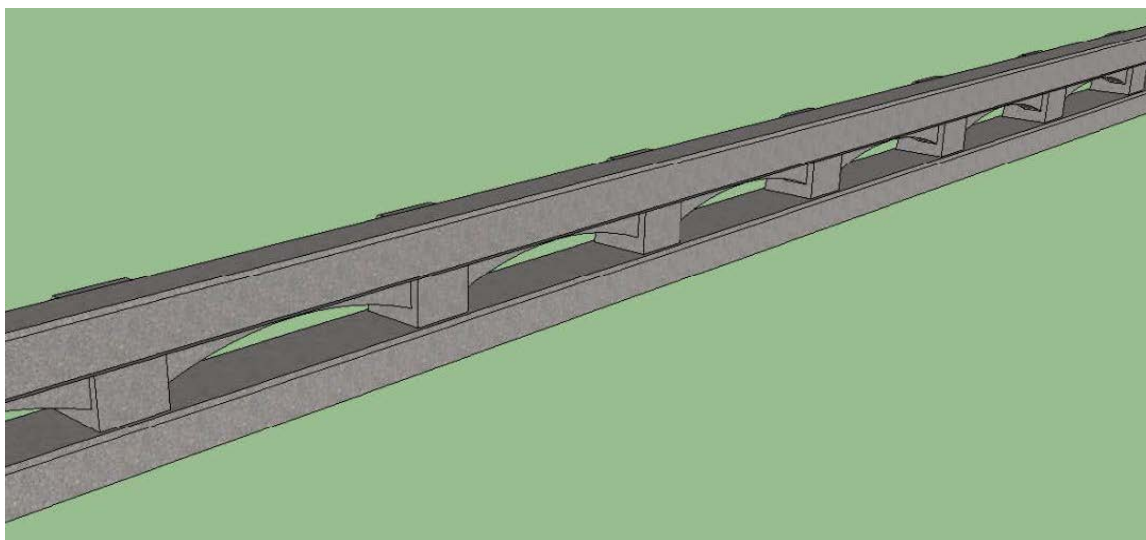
Cross-section of the concrete beam and post railing (ODOT 2014)
